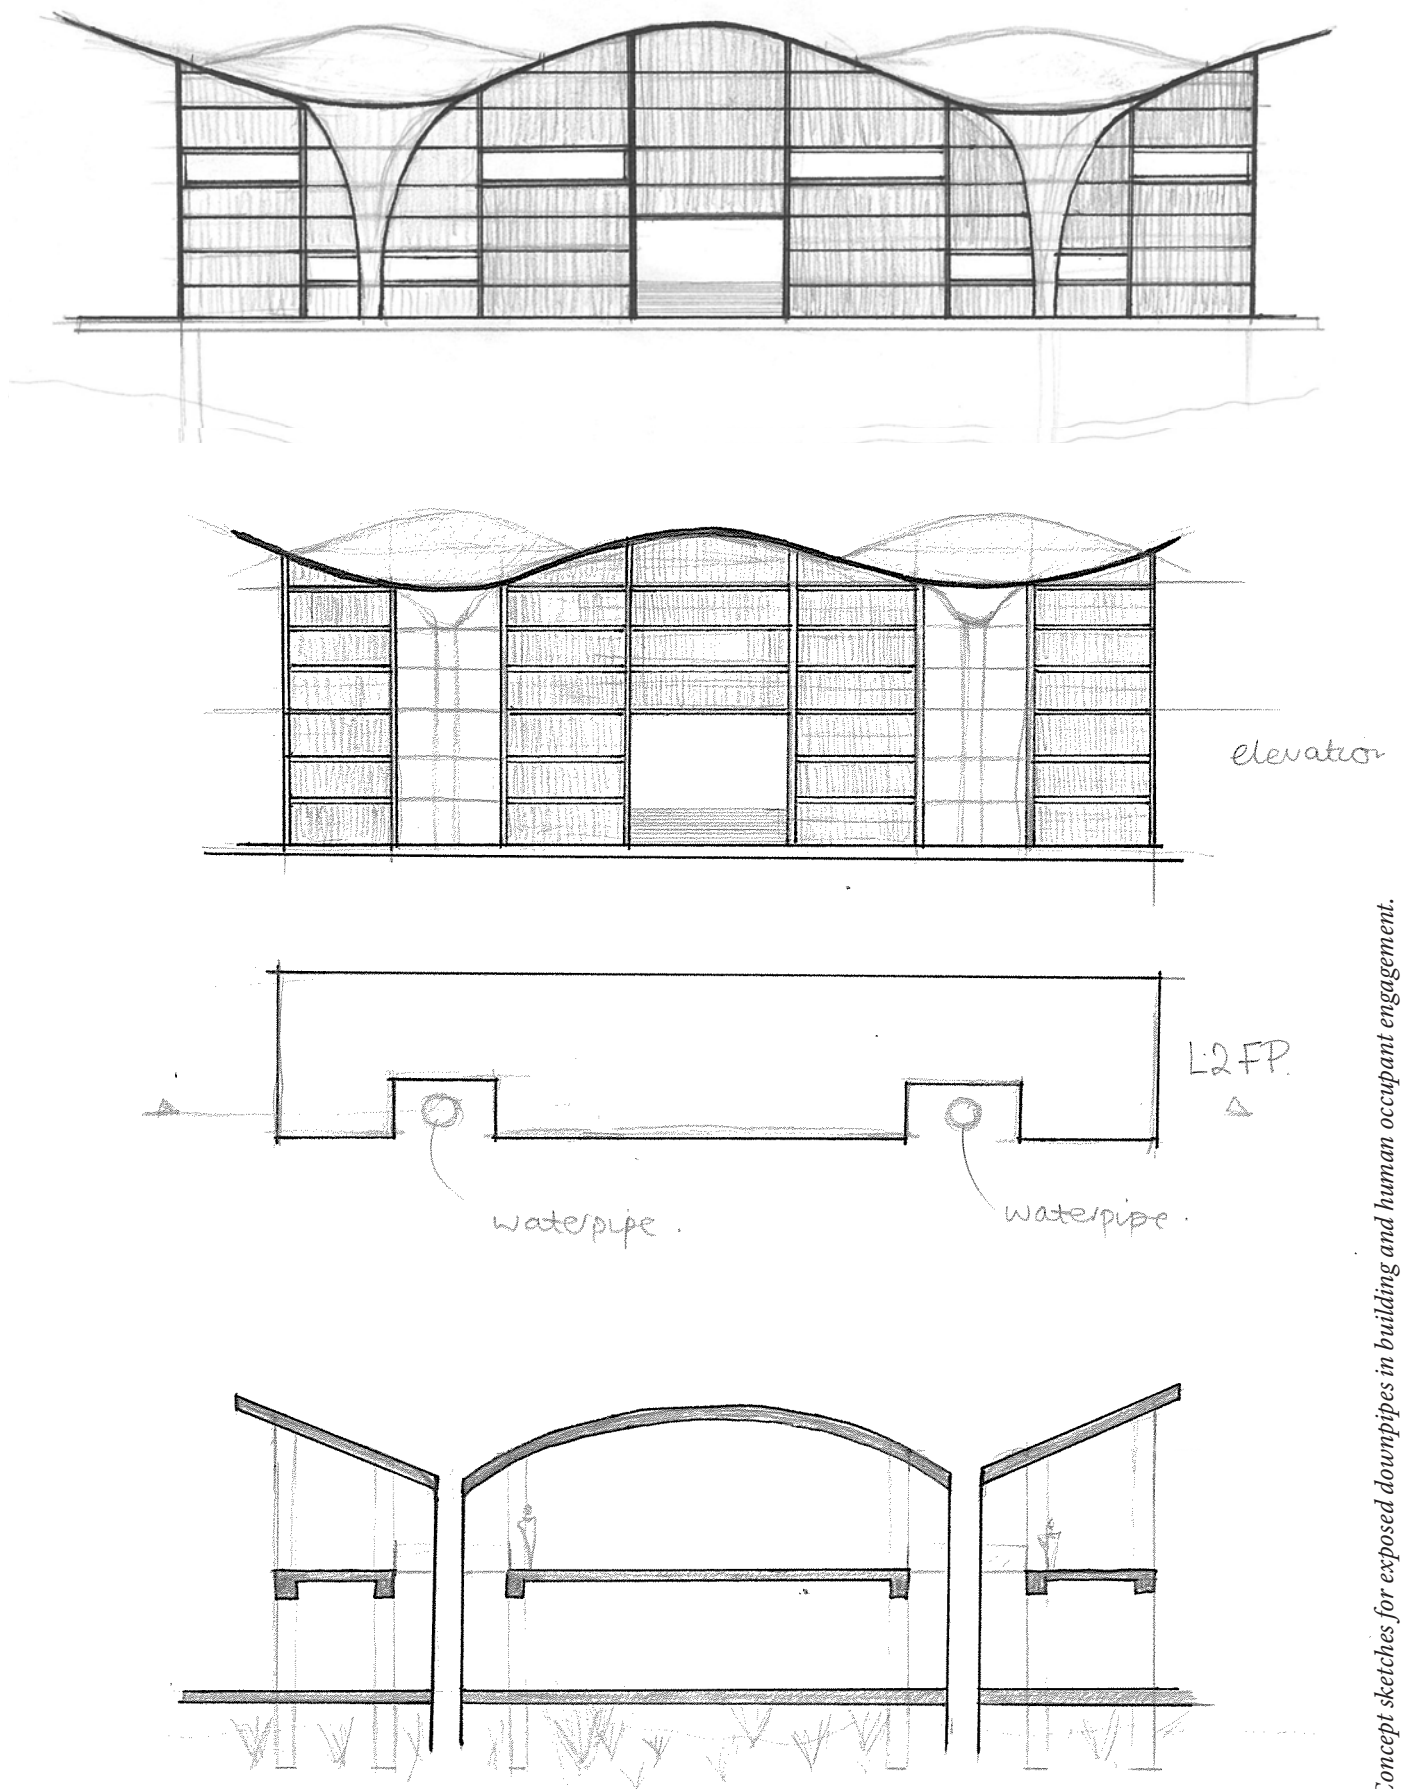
Concept sketches for exposed downpipes in building and human occupant engagement.
